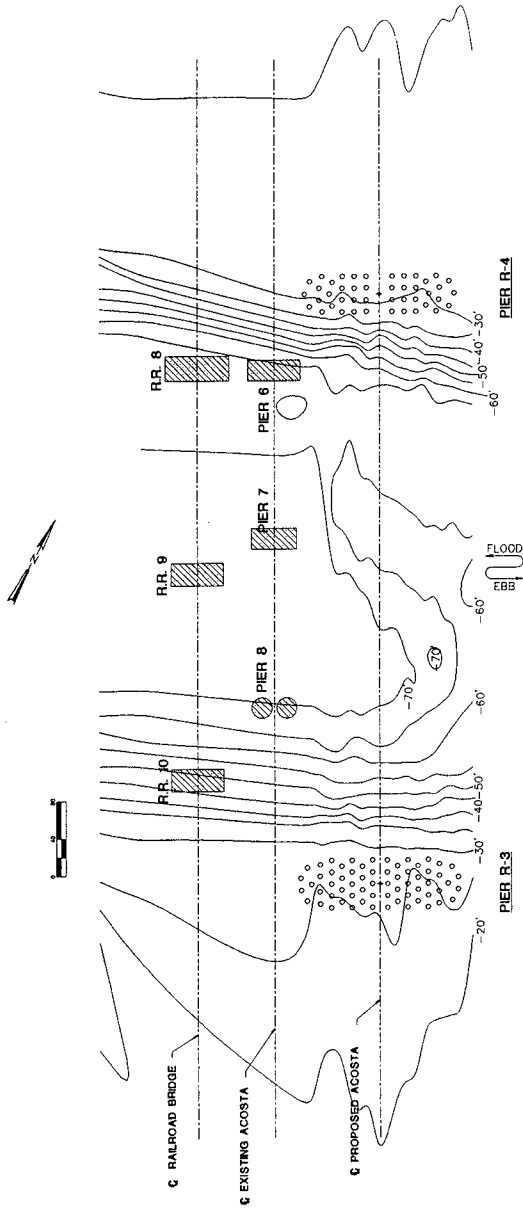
Plan View of the Acosta and Railroad Bridge Piers
